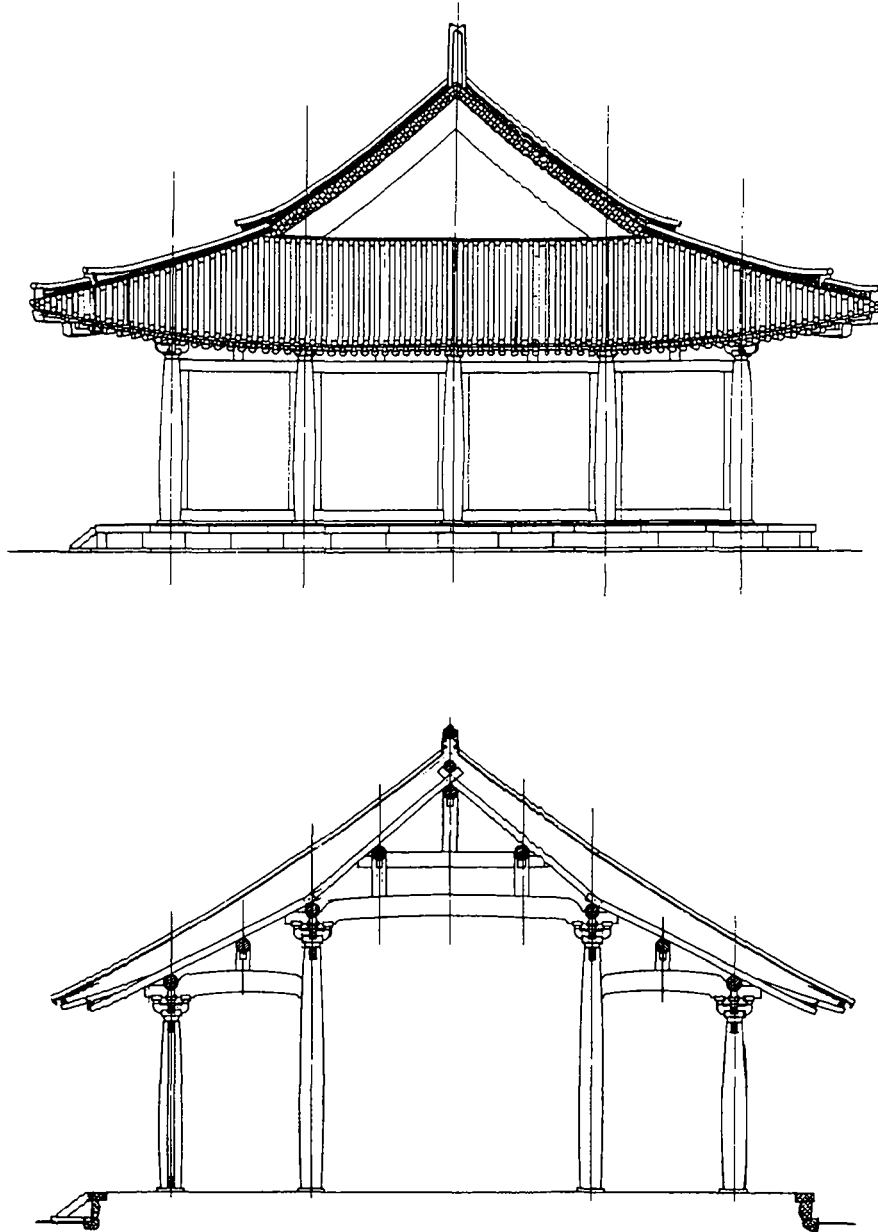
Reconstructed lateral elevation and section of the lecture hall of Güm-gang-sa
